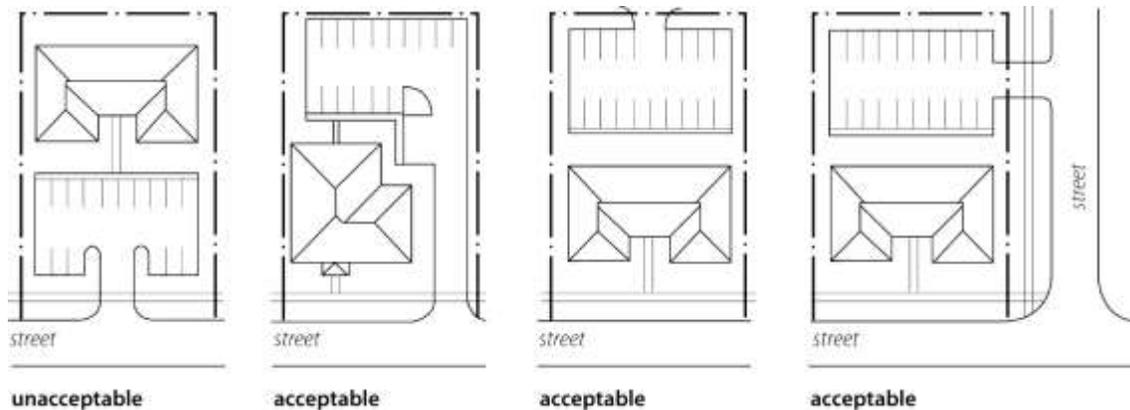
Multi-dwelling Building, Parking and Access
